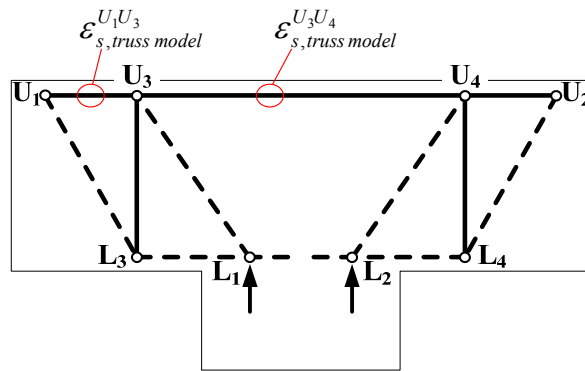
Strains in the longitudinal tension reinforcement of truss model
